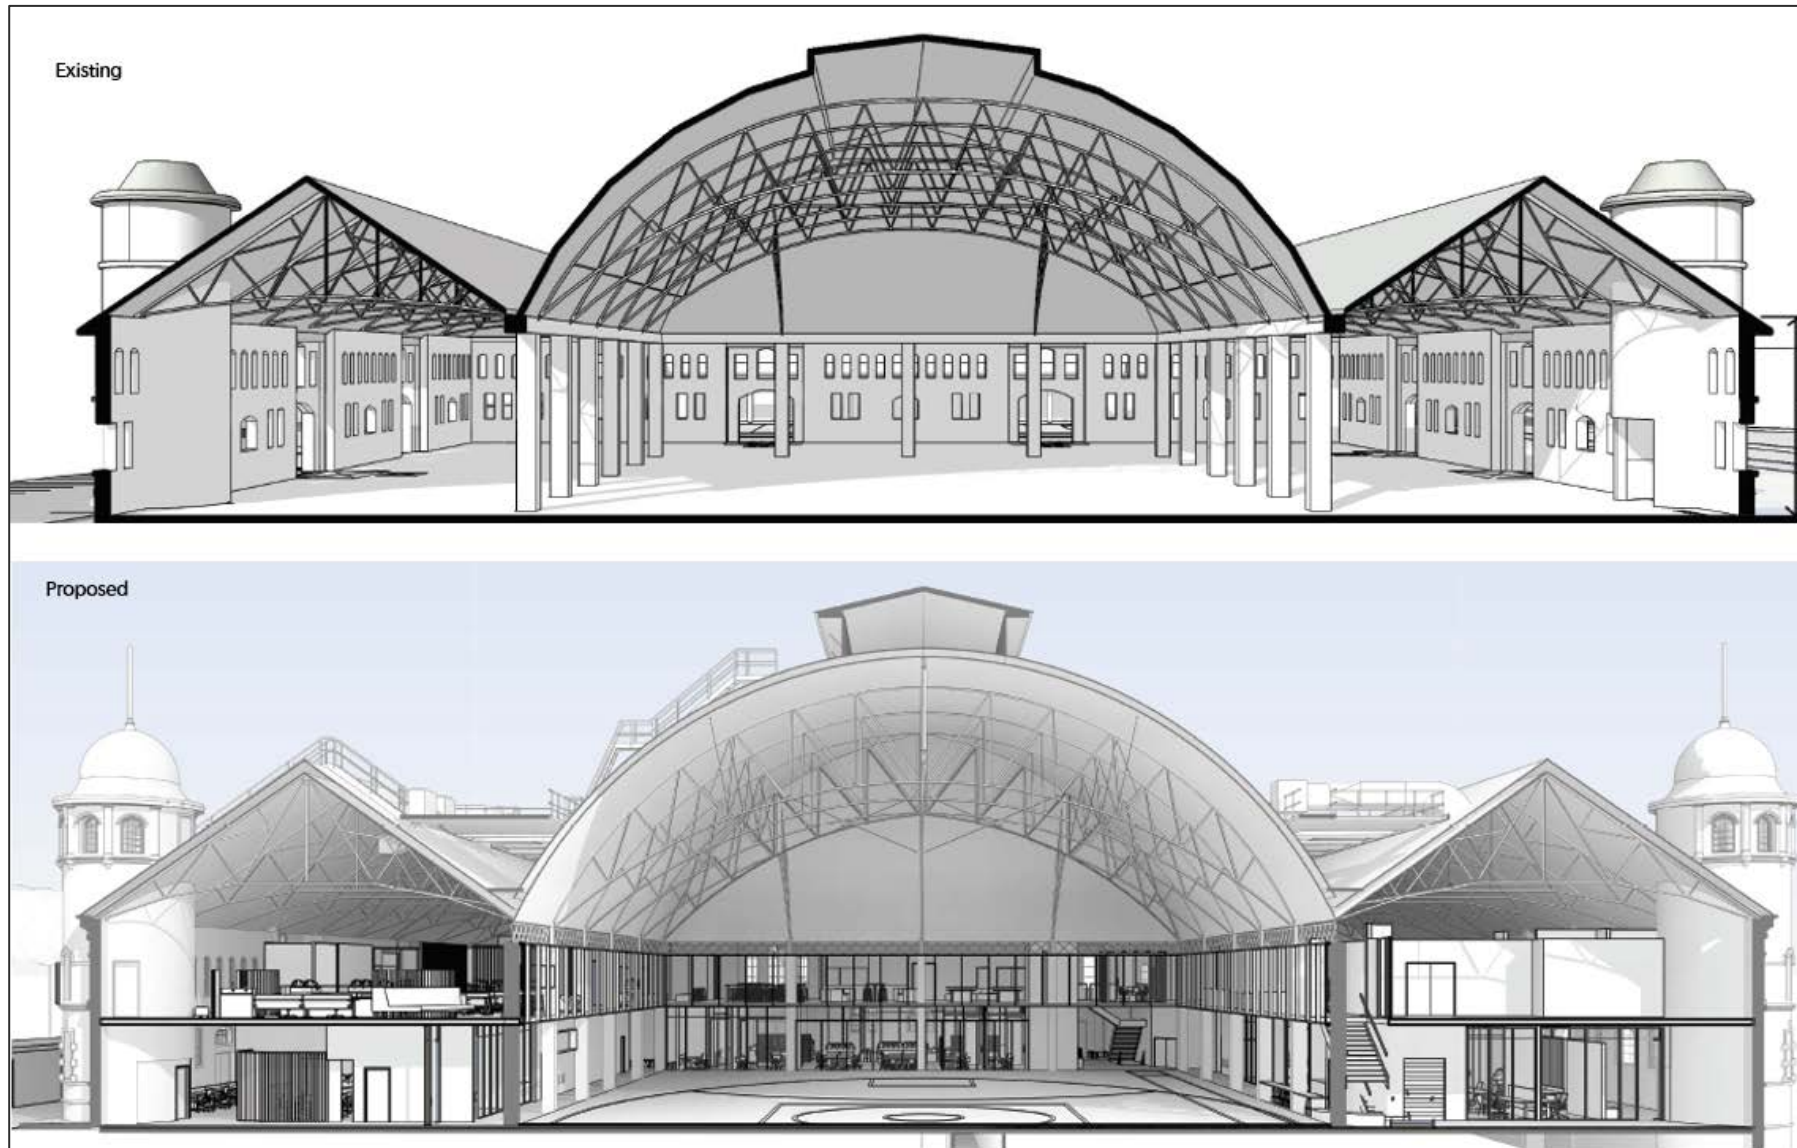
| Artist's impression of existing and proposed internal space within the RHI building (Source: Applicant's Design Report)
